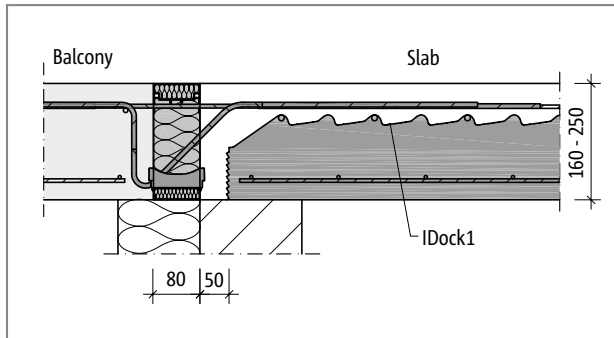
Schöck Isokorb® T type K-E: Connection of balconies with slab thicknesses of 160 mm to 250 mm with IDock1
